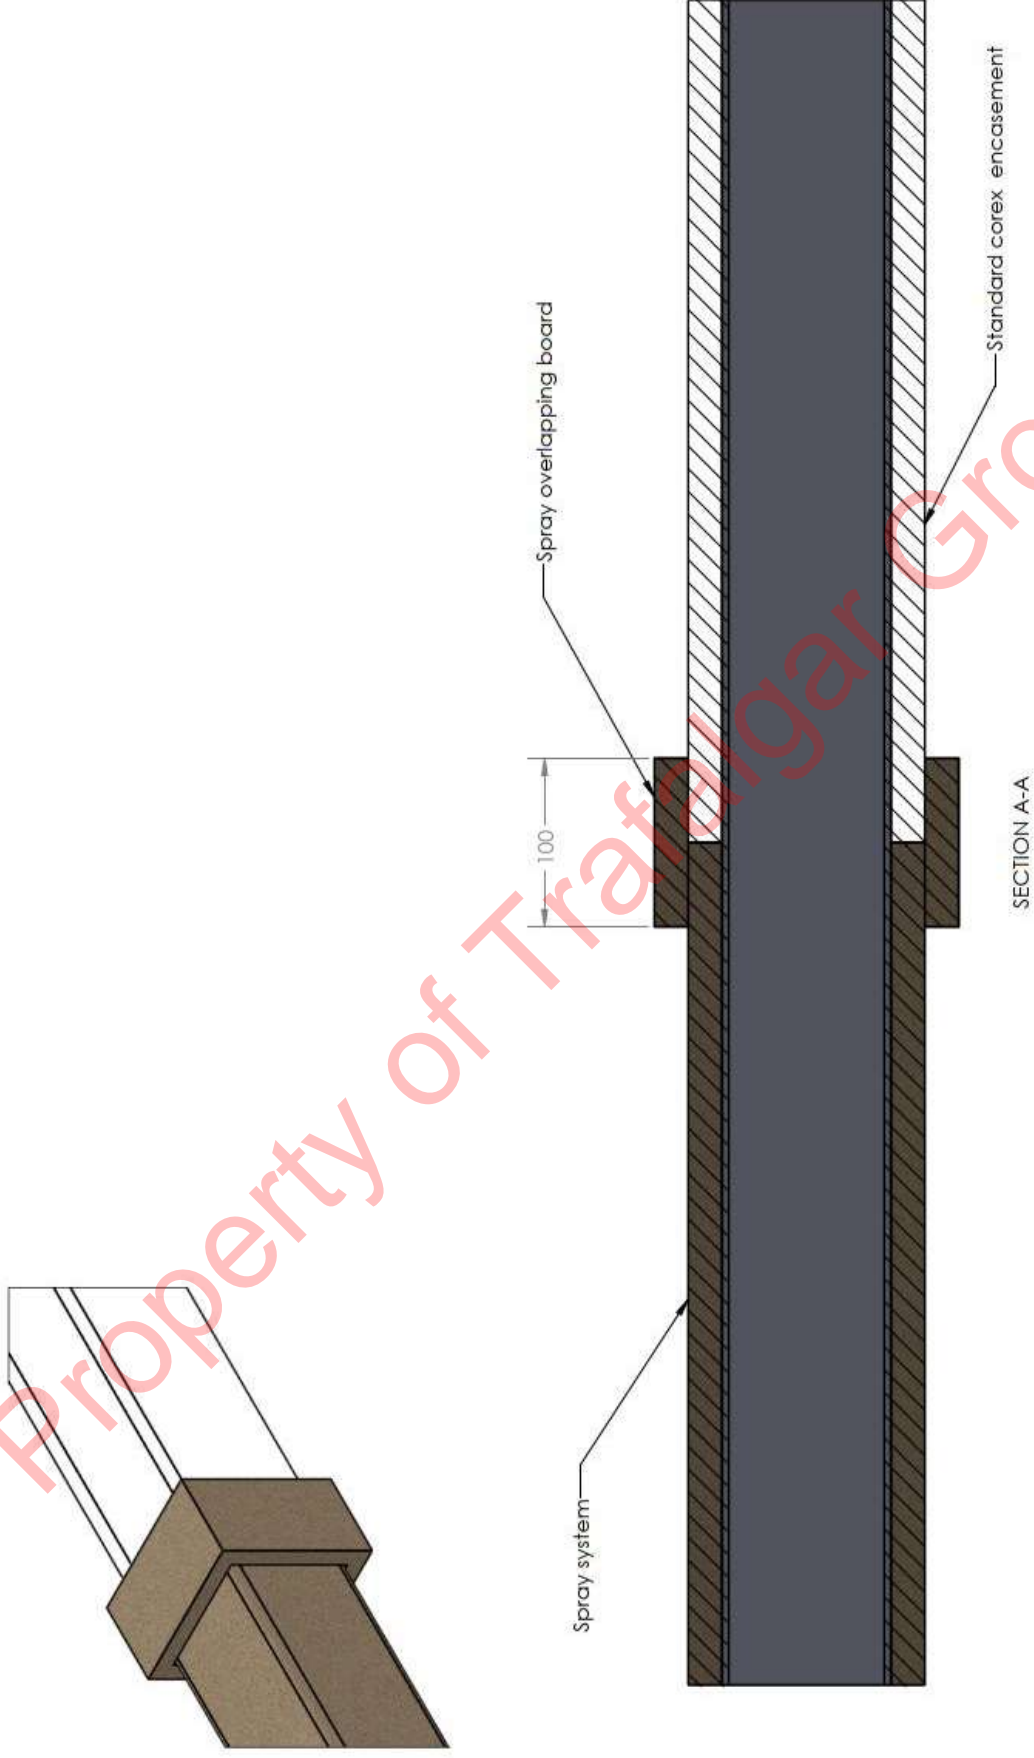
The construction detail when the spray protection system is added next to the existing board protection system – Option 3
